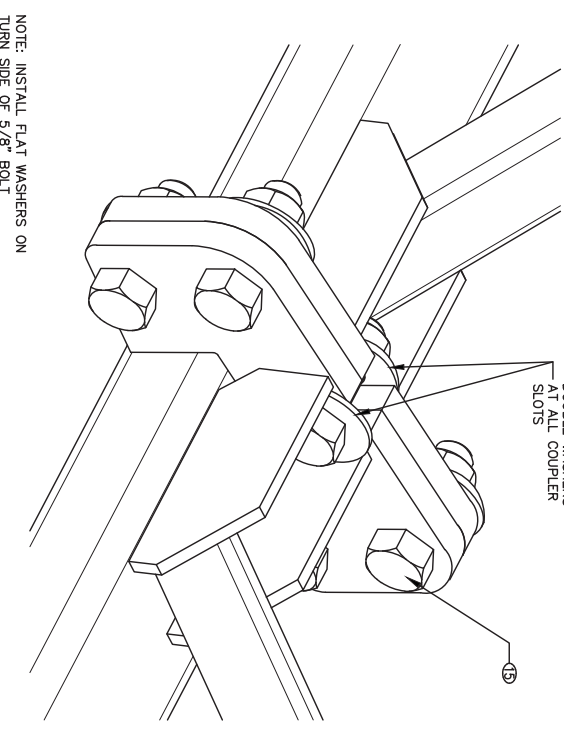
70'-80' VP CHORD BRACE TO PEAK TRUSS CONNECTION
